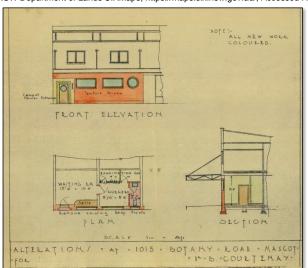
DA approval drawing of No. 1015 and 1017 from circa 1949, showing that existing front façade and internal layout has been altered
